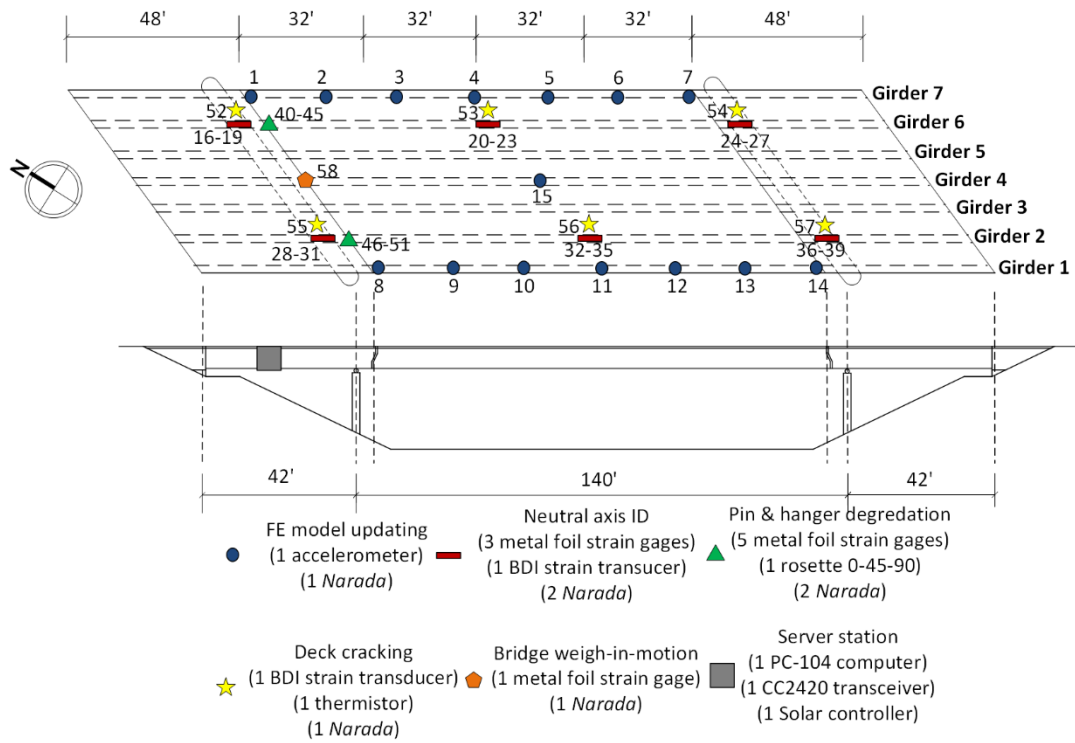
, Wireless sensor installation plan on the Telegraph Road Bridge
